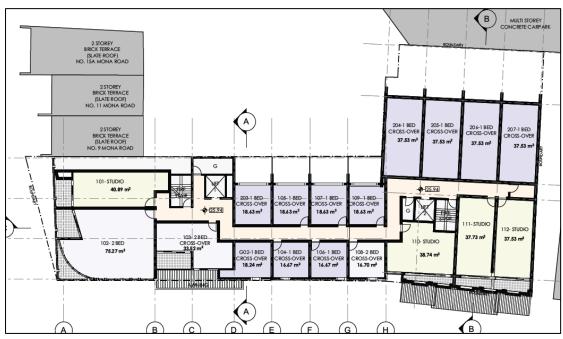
Proposed Level 1 plan. (Source: PTI Architecture Pty Ltd)
